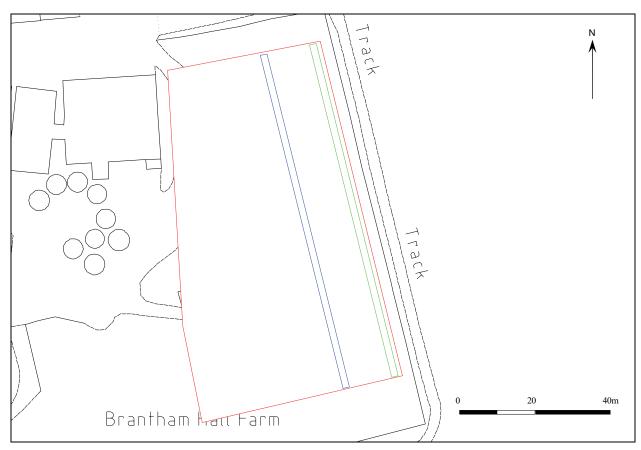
Plan of the evaluation trench (blue) and the drainage trench (green)
